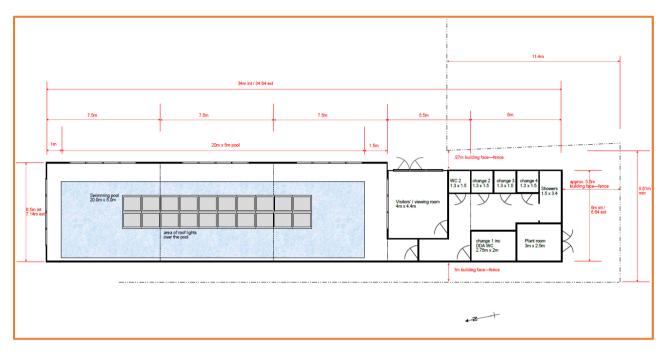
Proposed site layout plan (Source: Buckland Pool and Building Company)
